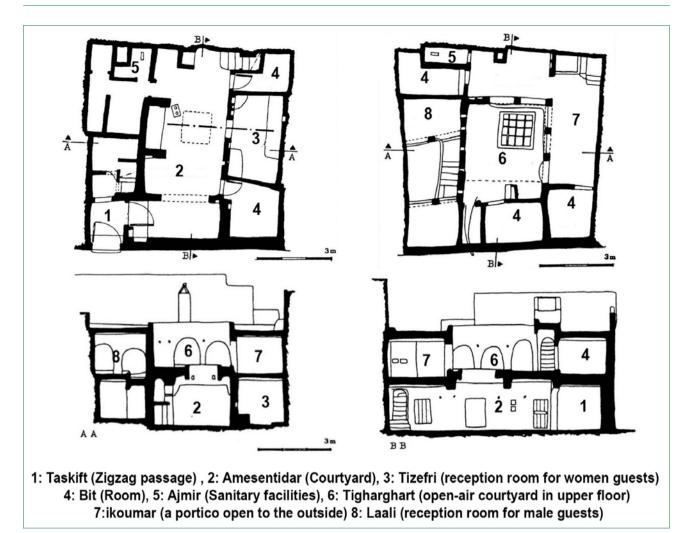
Holistic architectural presentation of typical mozabite house: Plans, sections, and axonometry (Bousquet, 2013).
